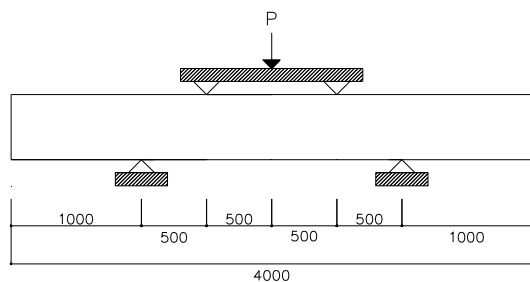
Test specimen setup<sup>5)</sup> (unit: mm)
